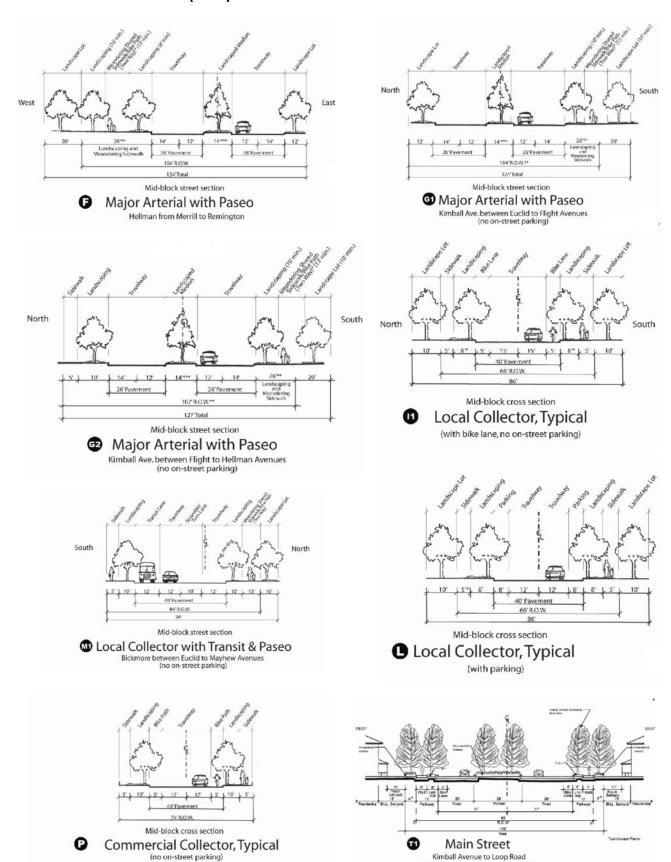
(20F2): THE PRESERVE SPECIFIC PLAN ROADWAY CROSS-SECTIONS
